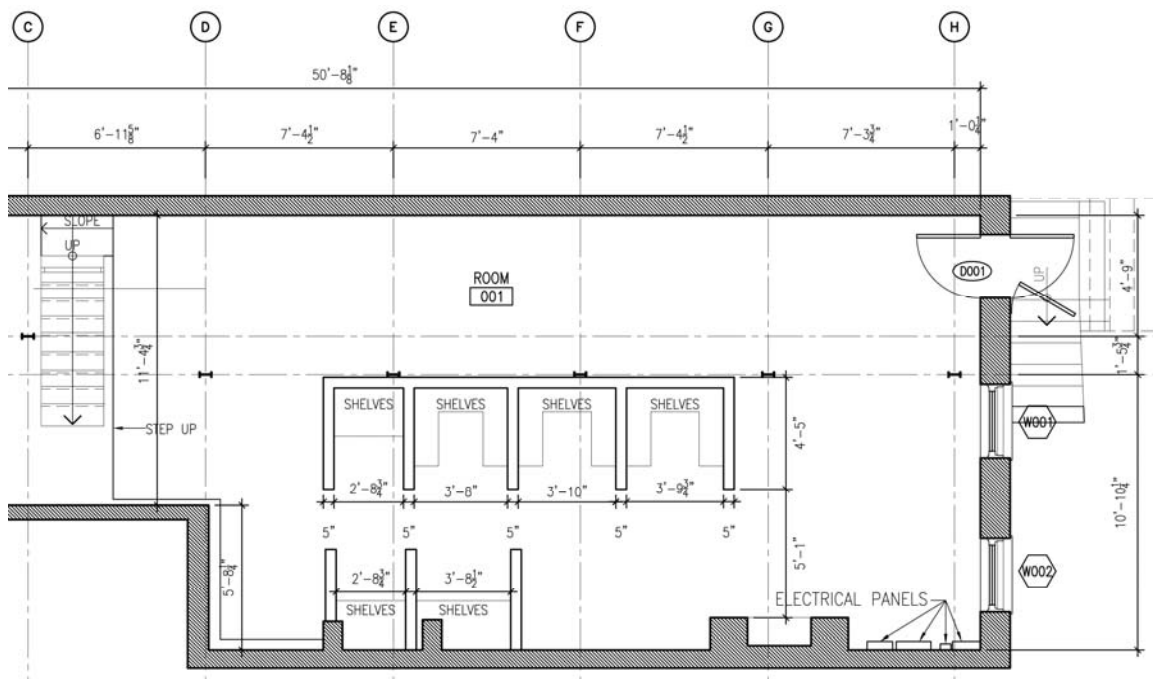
Room 001 floor plan. (Photo: BBB, 2007)
